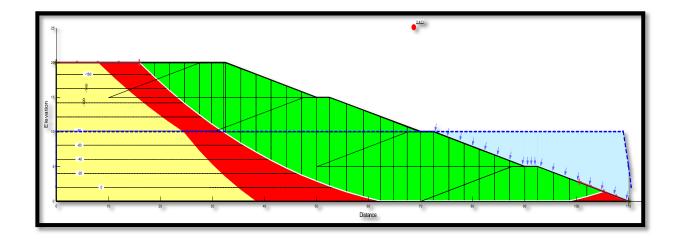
Embankment cross section for 1:3.5 slope at 10 m water level
